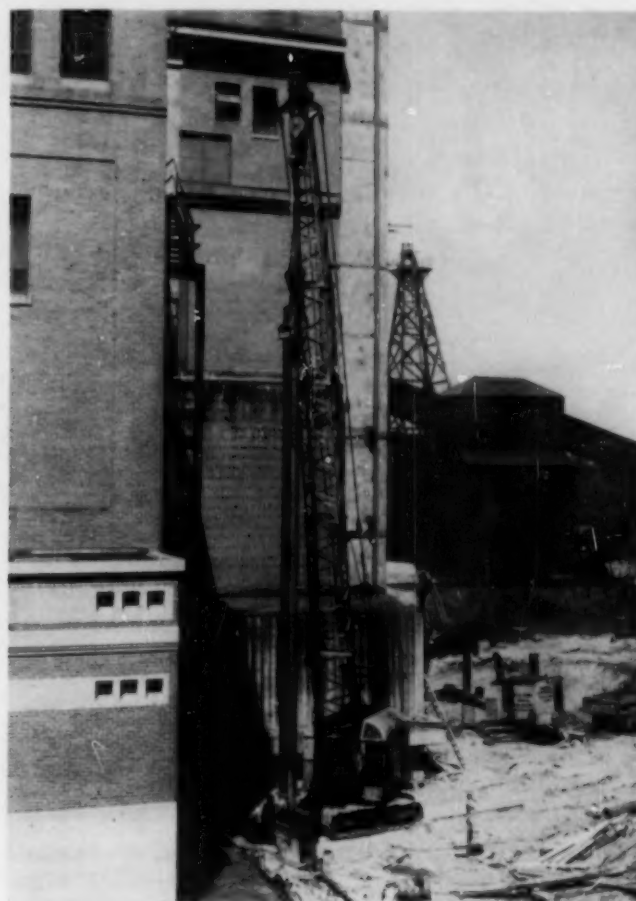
CRANE LOWERING H-BEAM CORE INTO CAISSON
